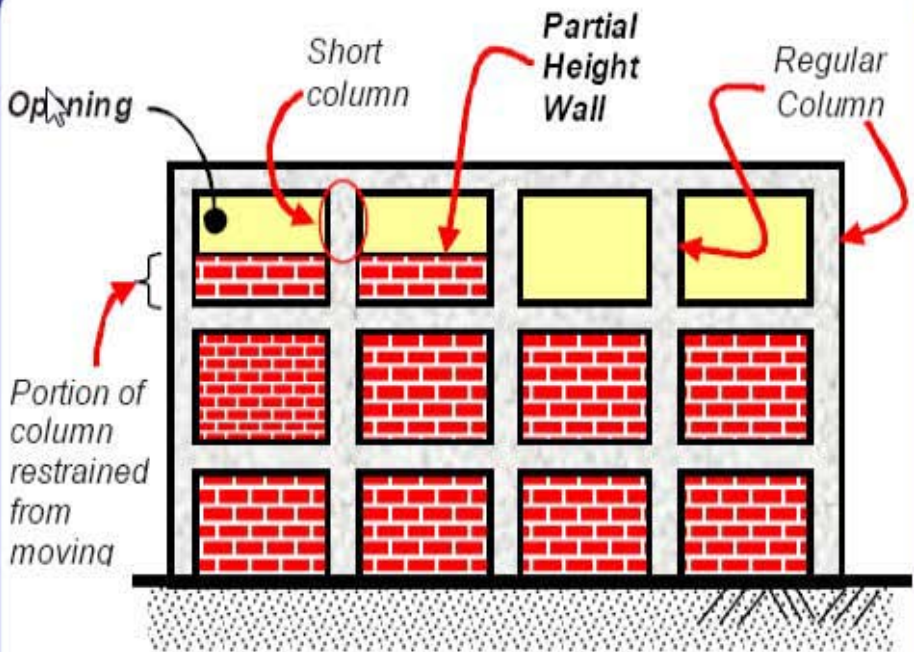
Short columns effect in RC buildings when partial height walls adjoin columns – the effect is implicit here because infill walls are often treated as non-structural elements.
